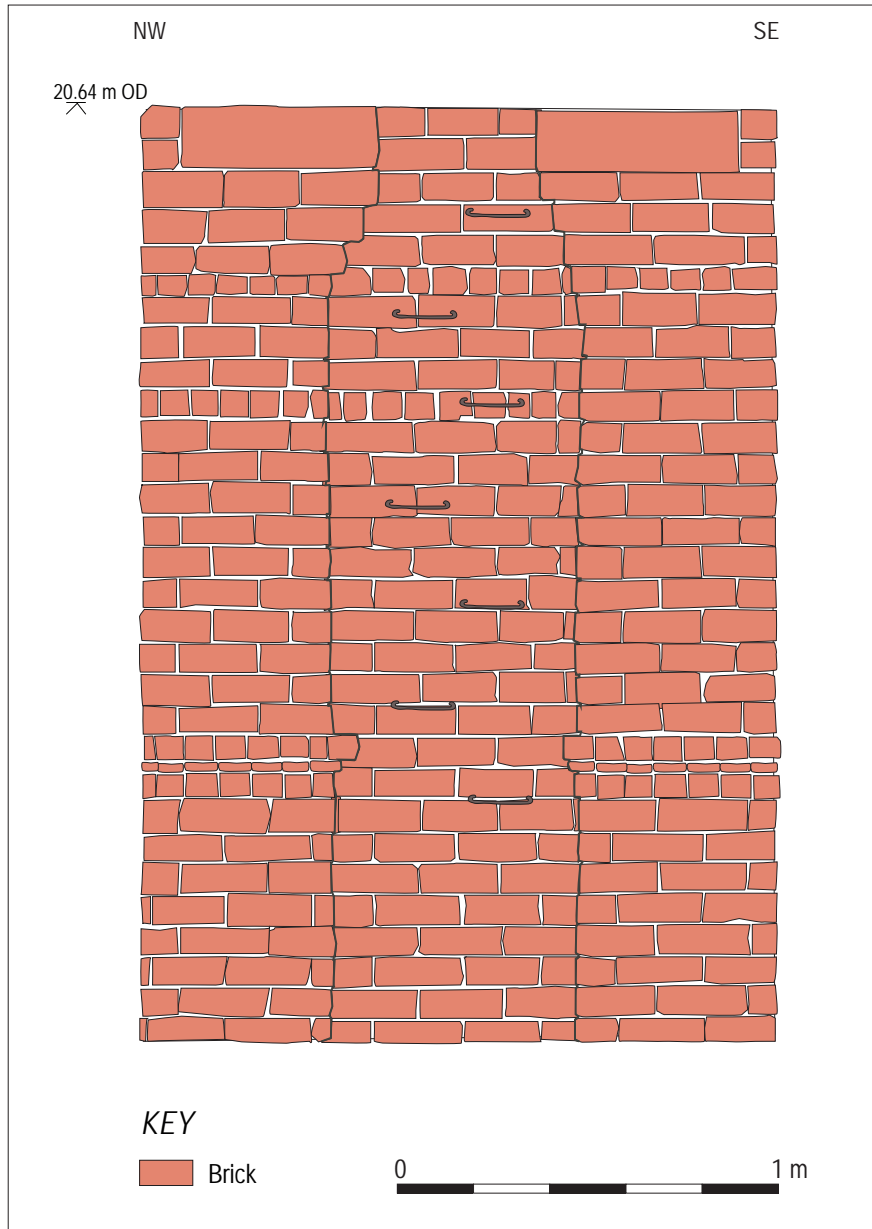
South elevation of the early Tram wheelhouse at Pilrig Street.
